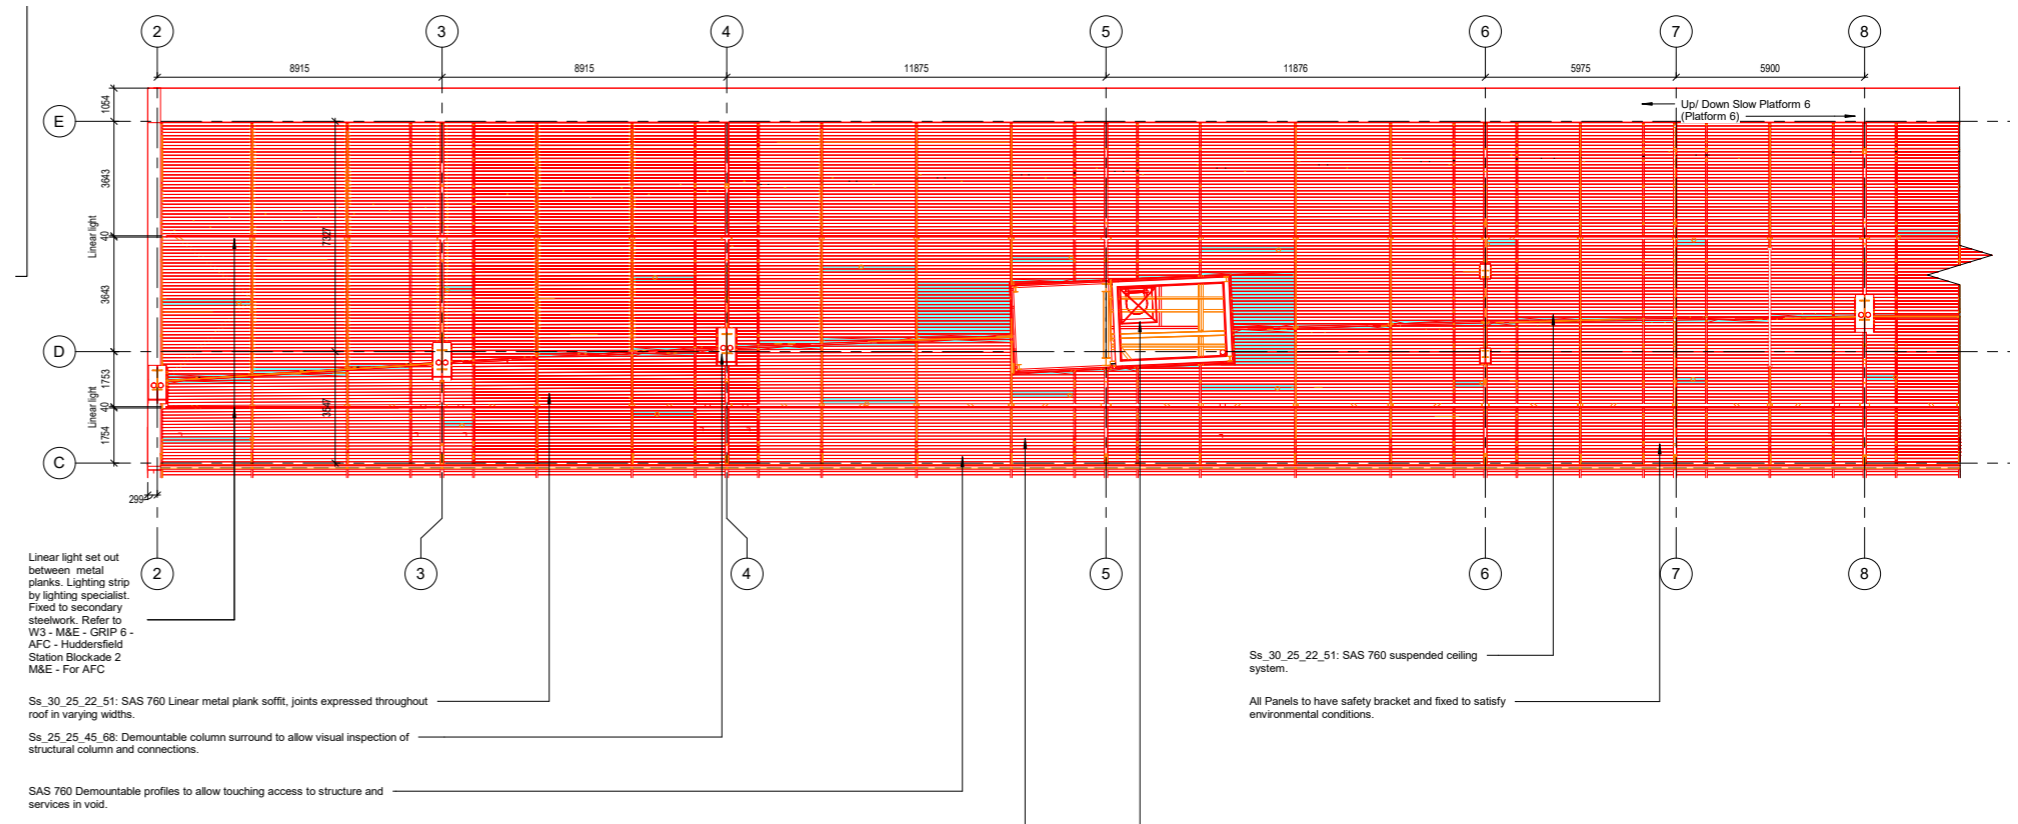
Soffit plan for roof C, showing the curve following the platform shape
